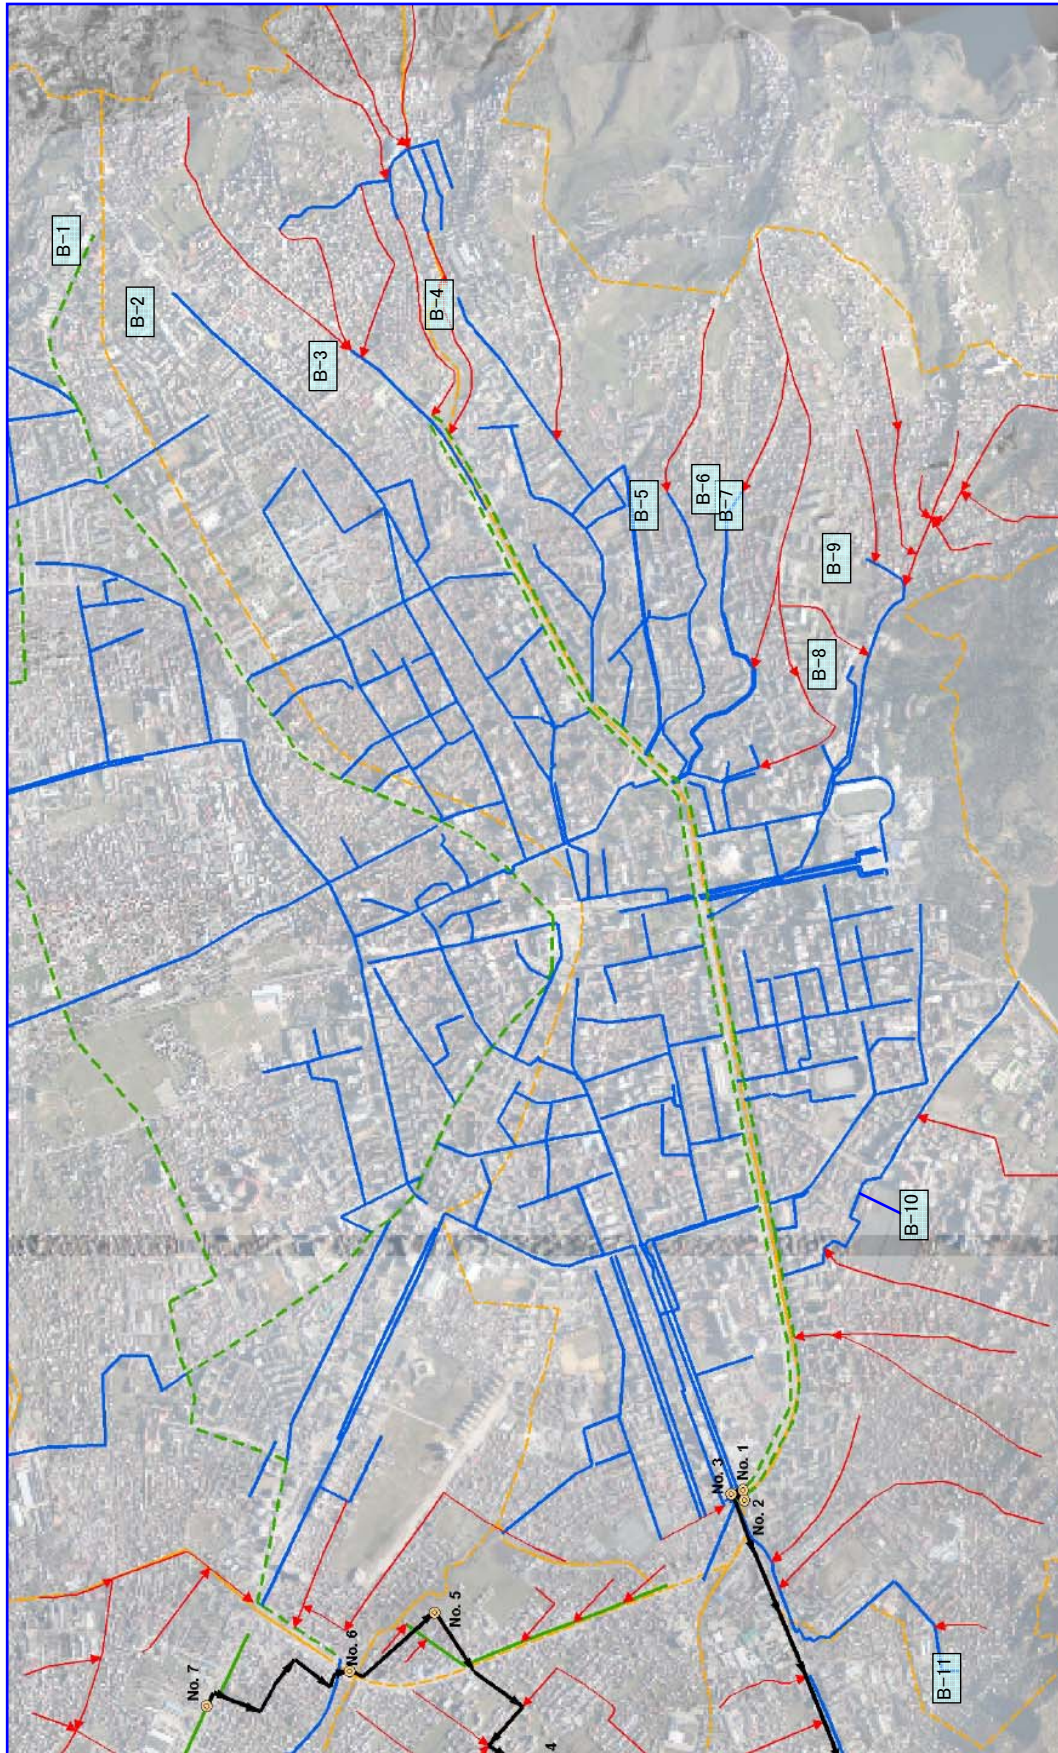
Investigation of Upper end of Existing Sewers for New Sewer Connections
